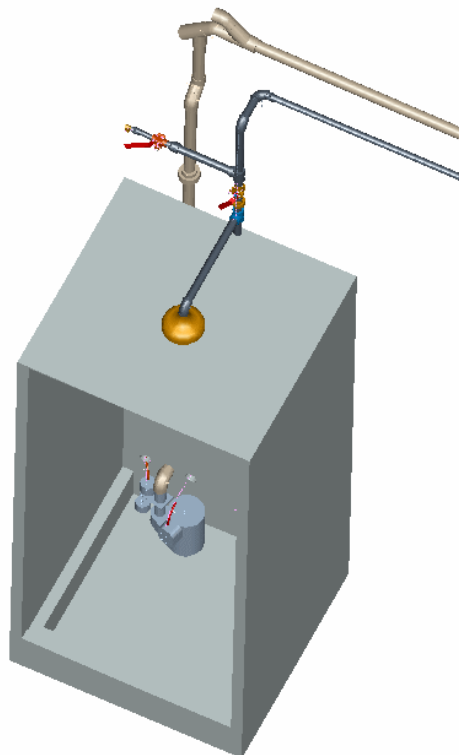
View of chemistry hood assembly in SRF materials lab. Detailed view of the emergency shower assembly.
